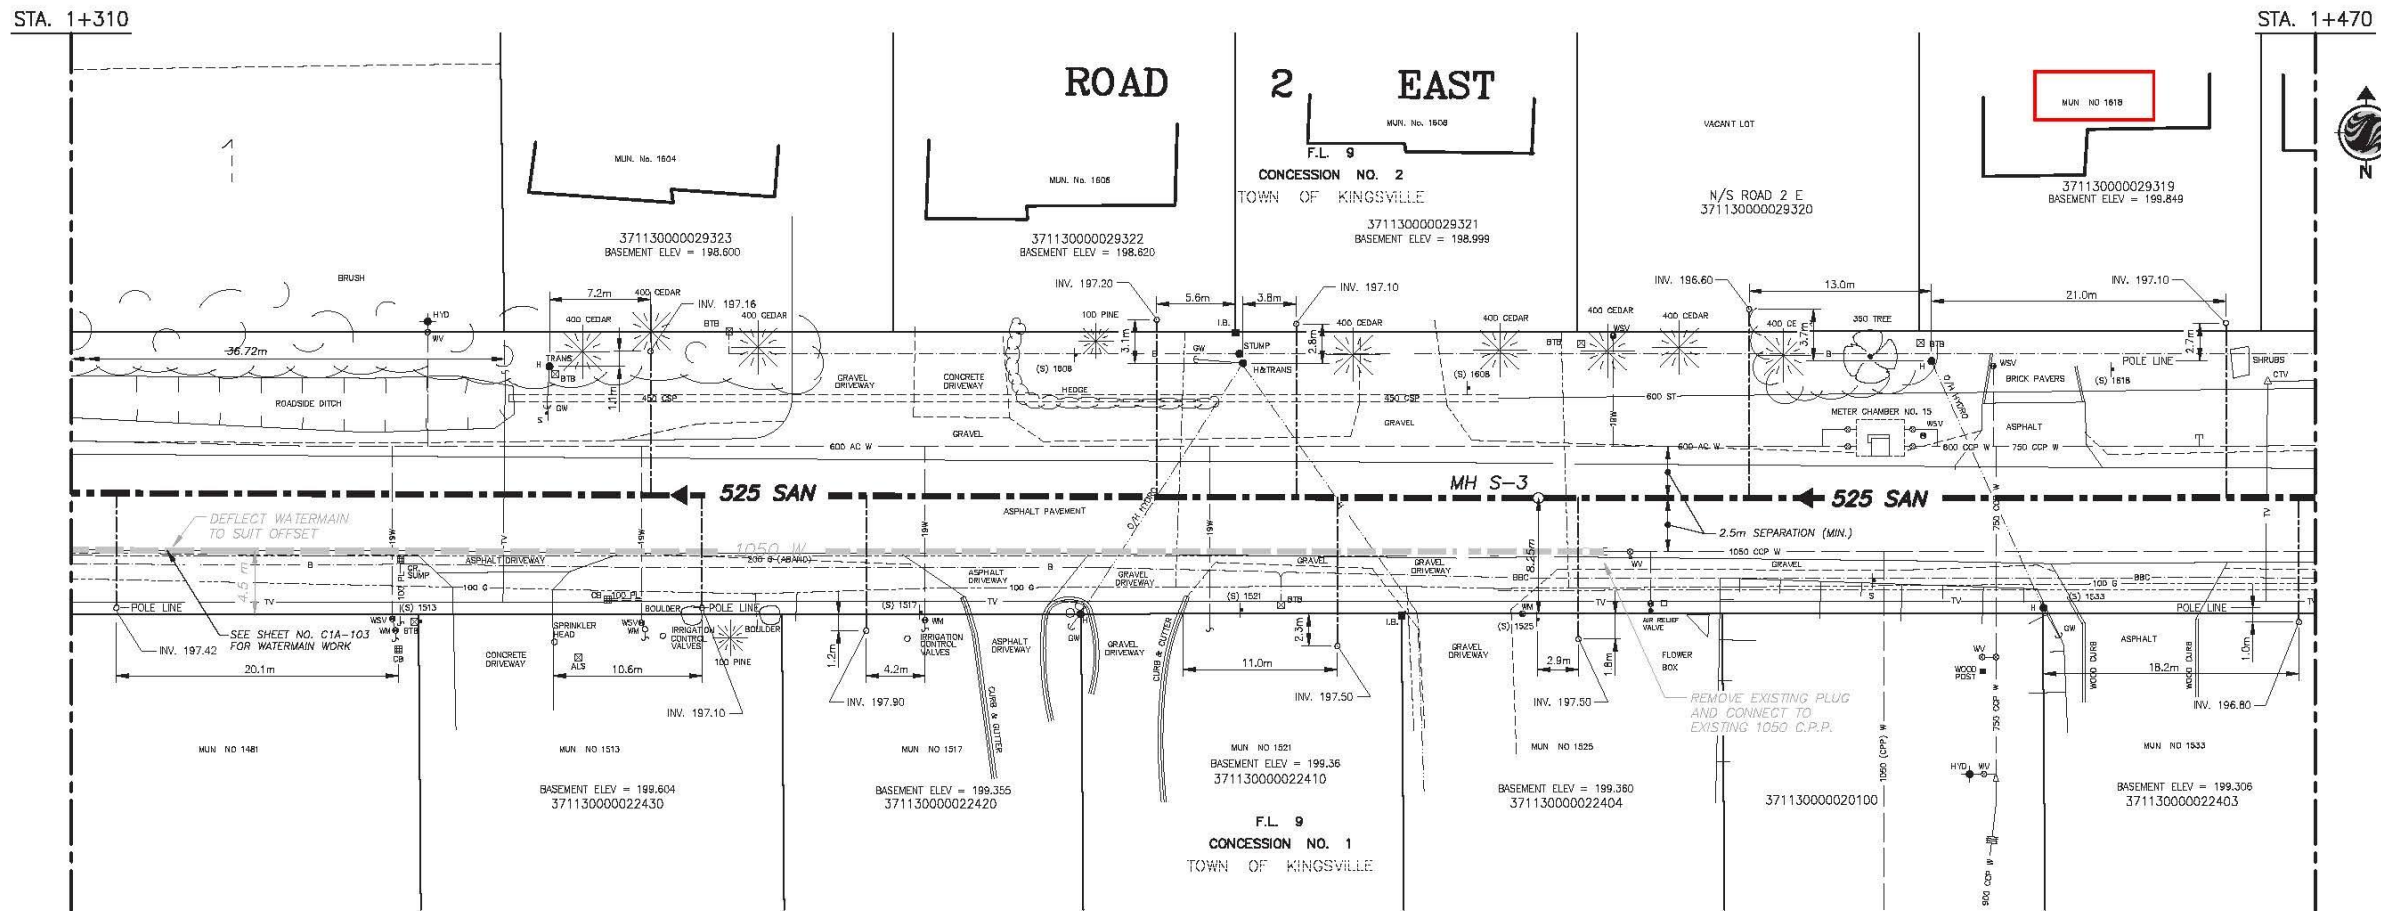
Tracy Reimer – Storm Sewer on Road 2 East
